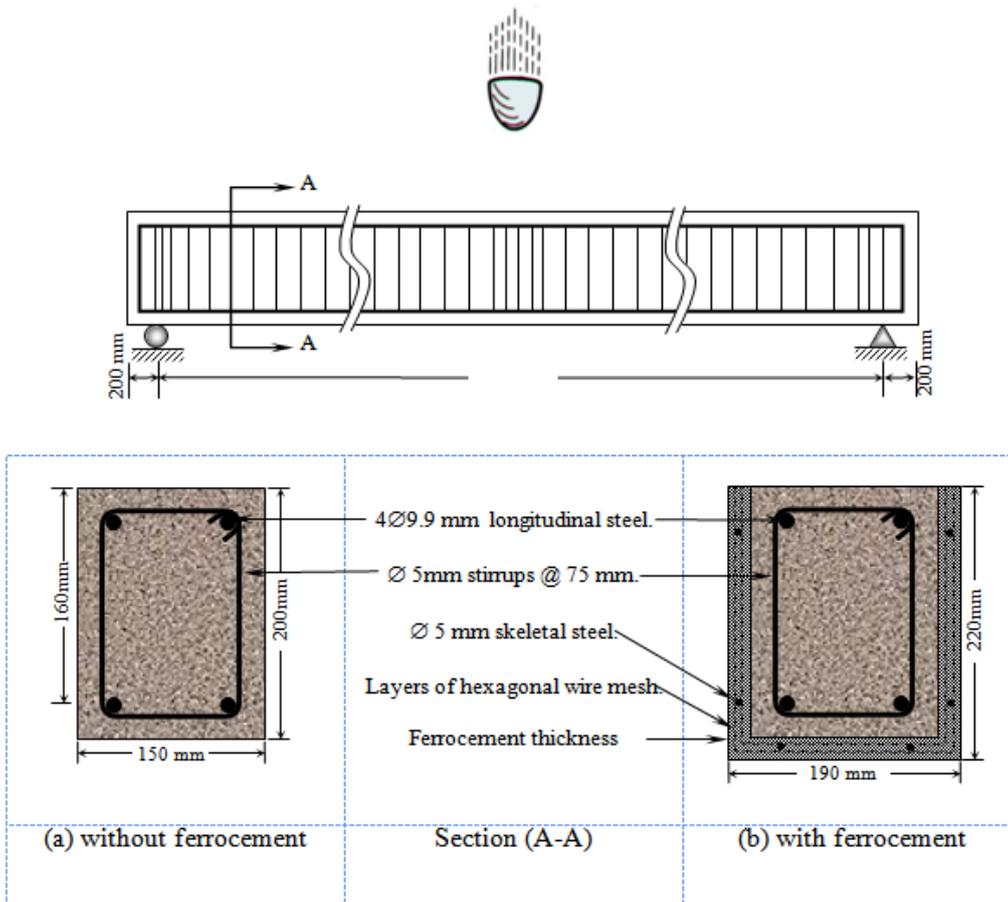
Beam geometry, and its reinforcement and ferrocement encasement.
